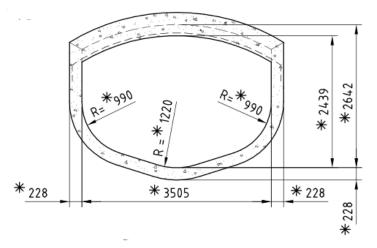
Nominal internal dimensions of the sewer. These vary along the sewer length due to construction tolerances and concrete deterioration
